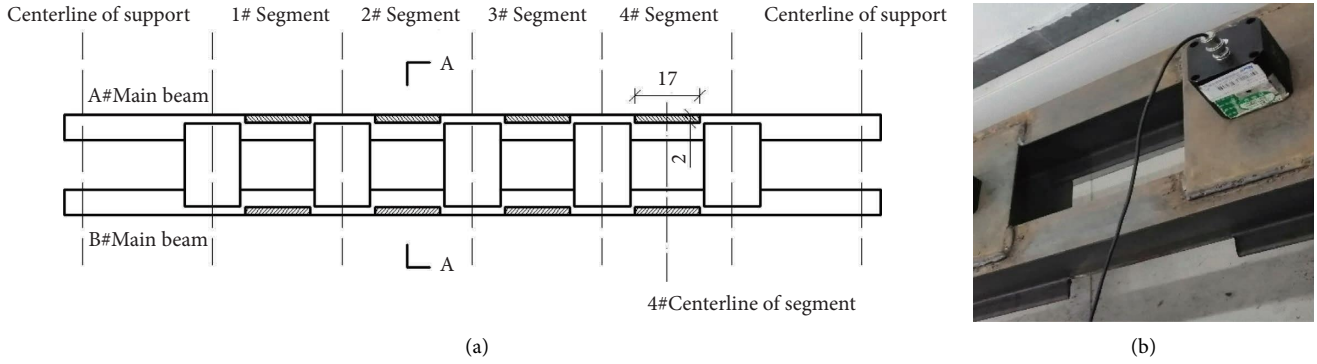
Test structure after damage. (a) Plane (unit: mm). (b) Actual damage.
